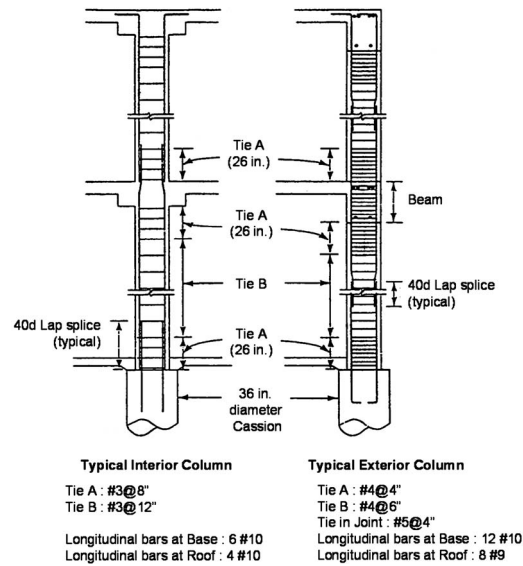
Typical (a) interior column and (b) exterior column reinforcement.
